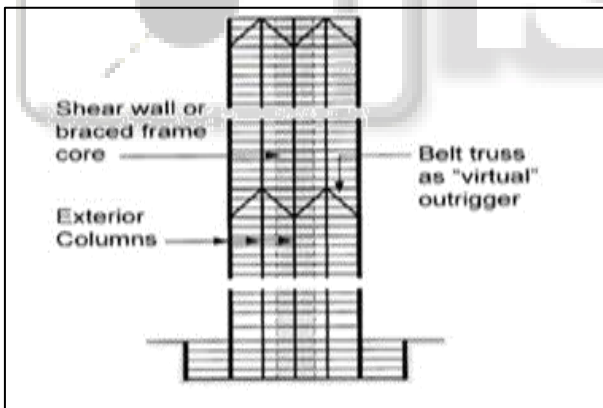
Structure with belt trusses as “virtual” outriggers
